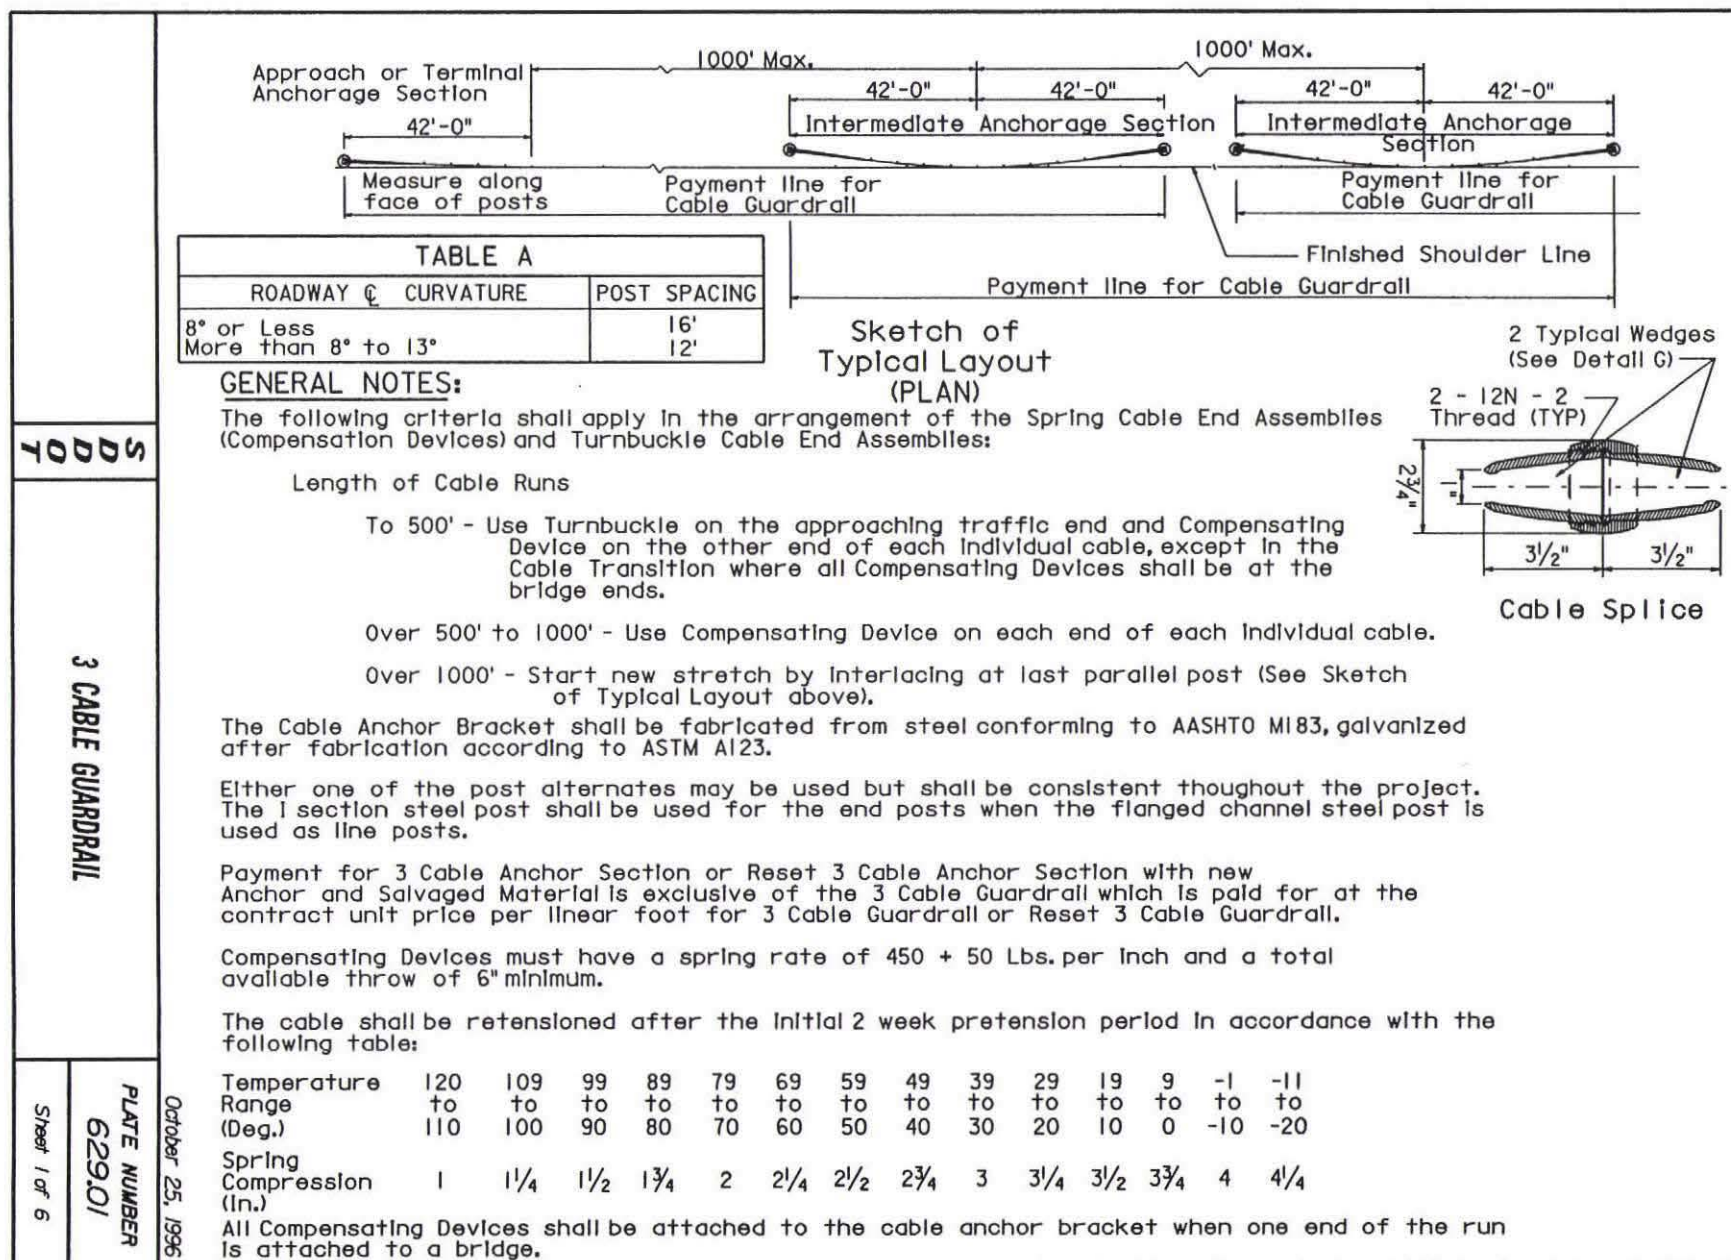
Cable Guardrail to W-Beam Transition Design Details (Continued)
